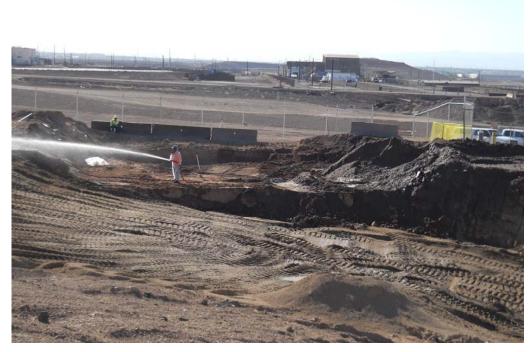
Facing west. Excavation progress toward end of third day. October 3, 2013.
